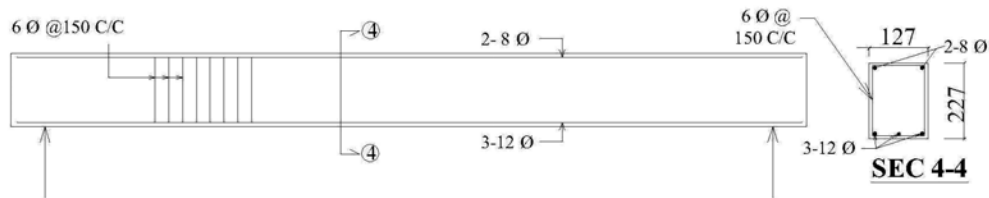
Longitudinal and Cross-Section of Unretrofitted Balanced Beams
